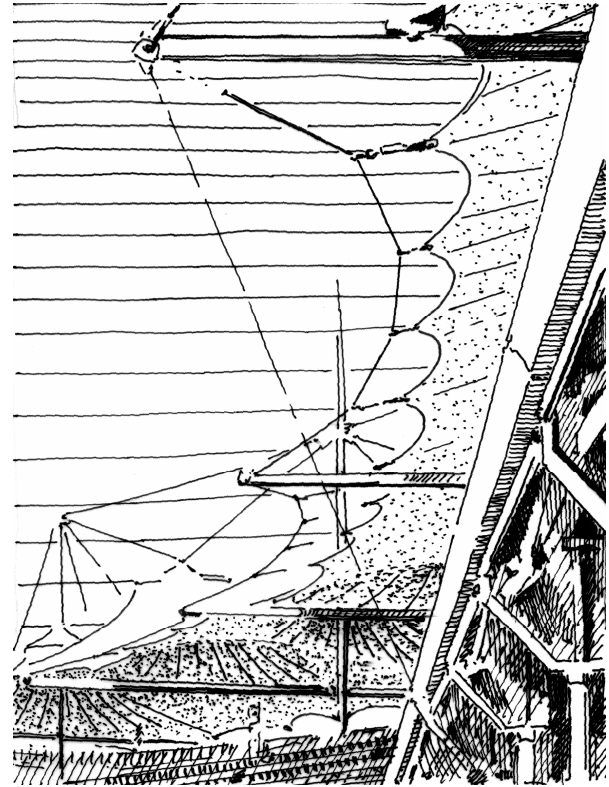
Grandstand roofing at Lord's Cricket Ground, London
